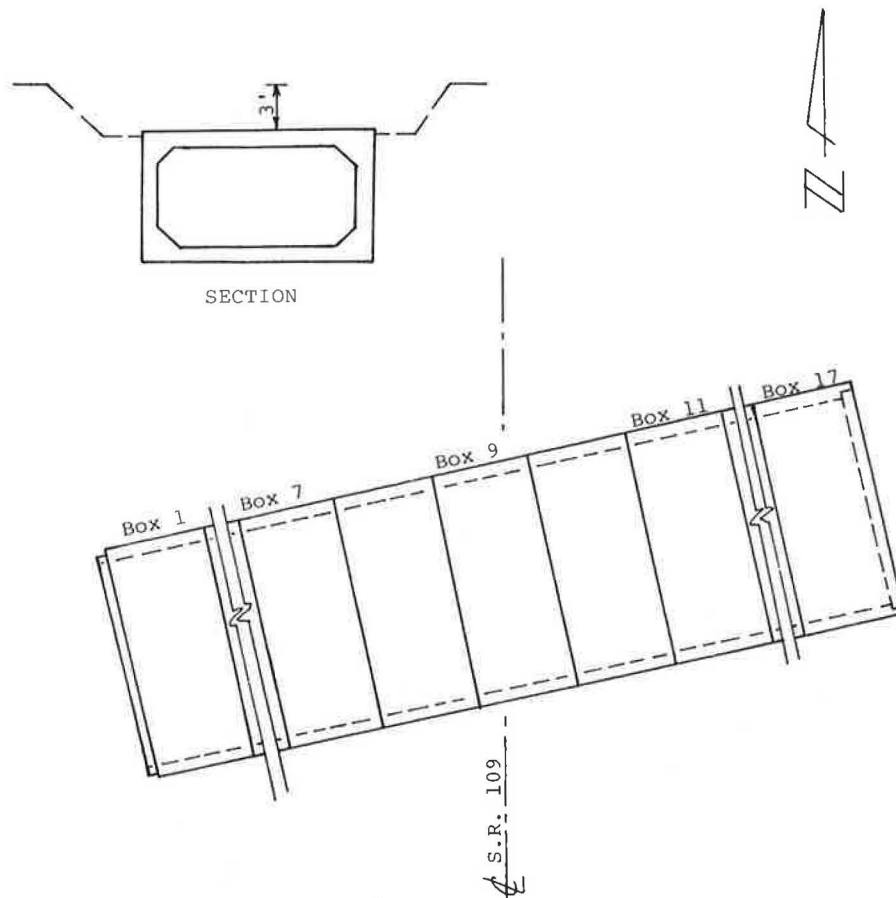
Arrangement of box culvert sections (Ohio DOT bridge PUT-109-02.67).
